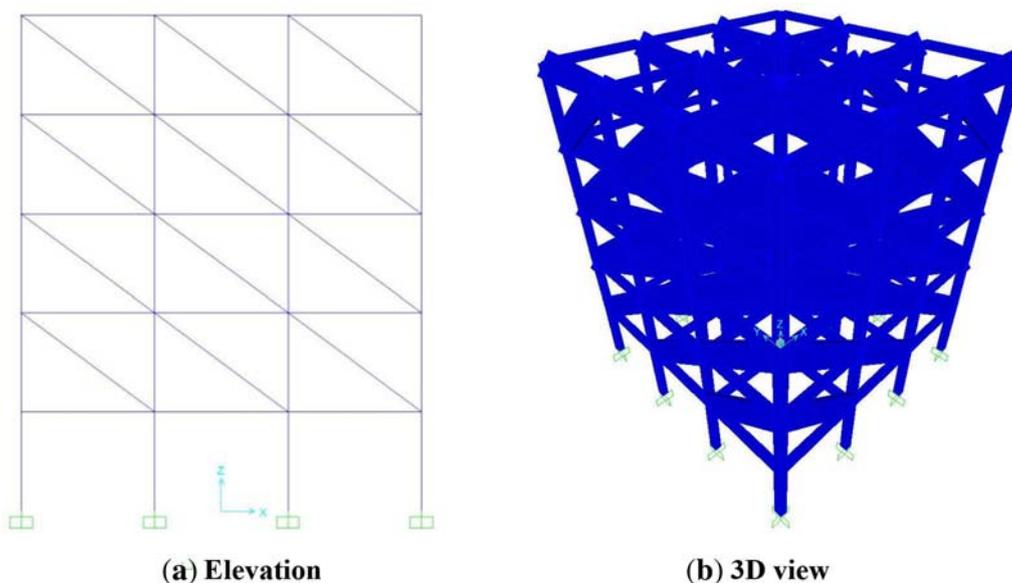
Elevation and 3D view of SAP2000 model of OGS building with fixed base.
